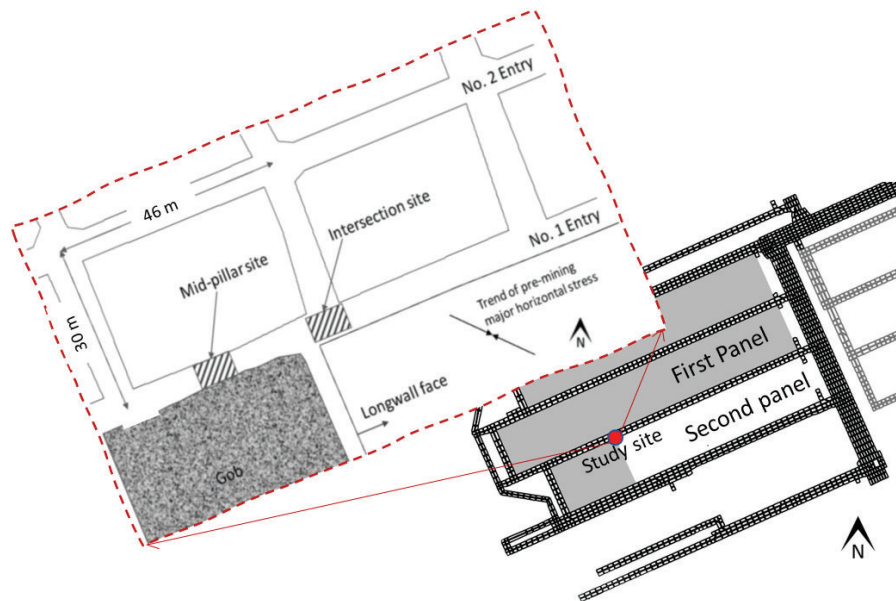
Pillar layout and monitoring site location at the longwall mine selected for this study.
